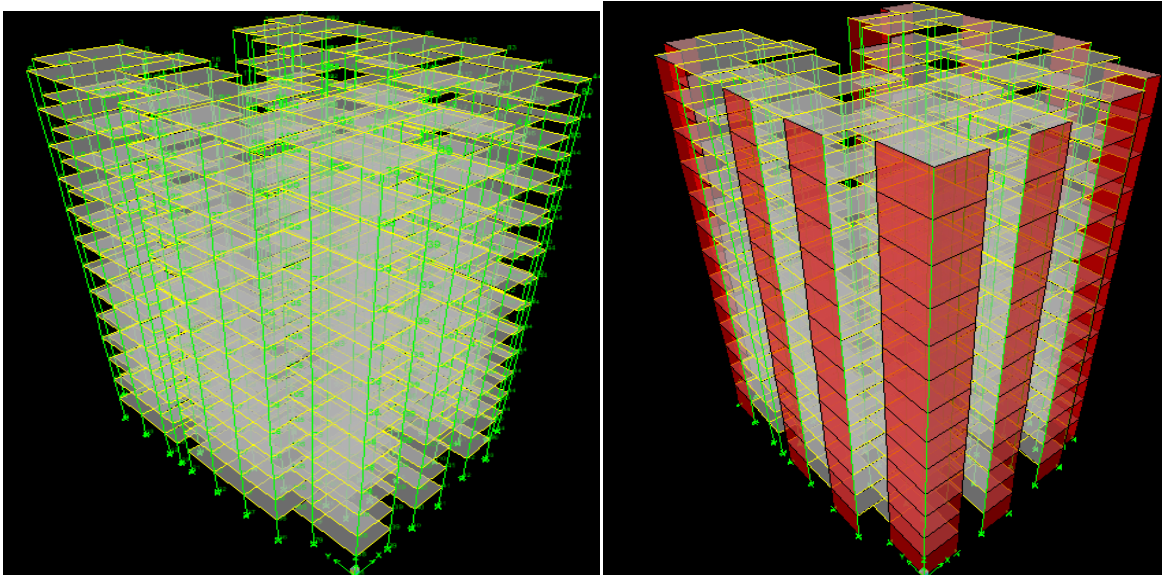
and 3 shows the 3D view of regular building with shear wall and steel bracing and 3D View of irregular building with shear wall and steel bracing respectively.
